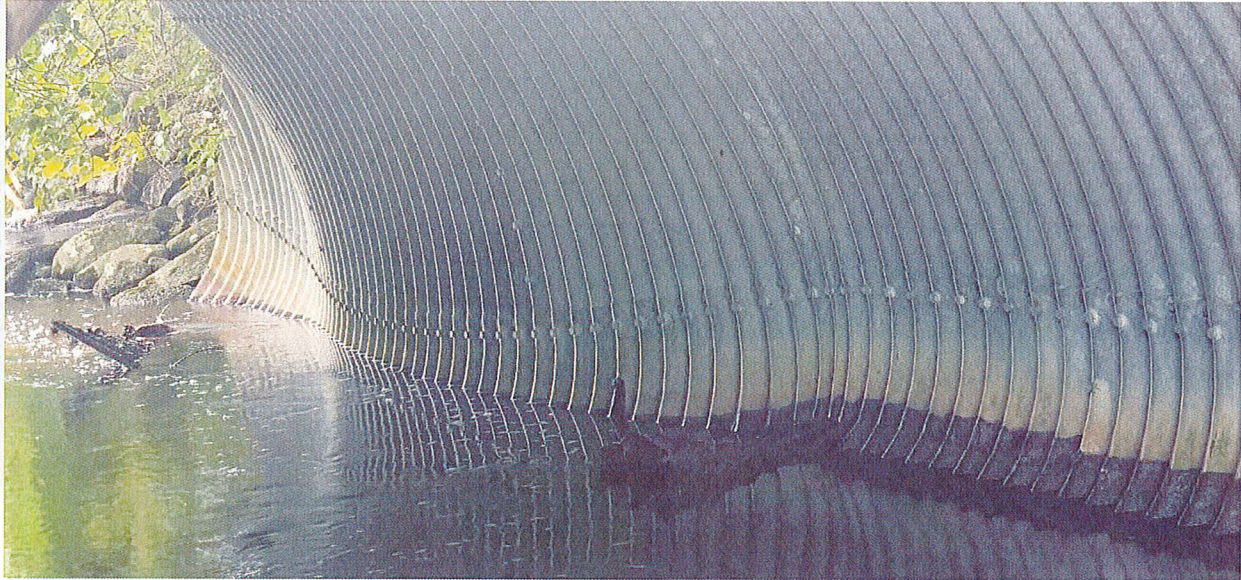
Bulge in culvert below sinkhole. Photo taken facing East.
